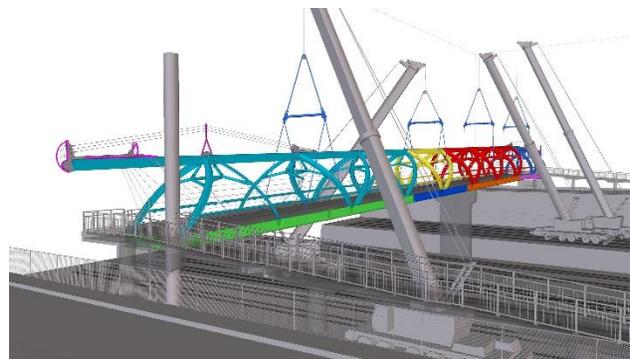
The John Street Pedestrian Bridge in Toronto, Canada was shipped to site in a minimal number of pieces. There was adequate space adjacent to the railway cut for site assembly to take place. As it was to be erected over a rail corridor, the erection had to take place at night to accommodate a 4 hour stoppage of train traffic. The position of the crane was chosen to allow a clean swing lift from the staging area north of the tracks to the finished position. Drawing by Walters Inc. Steel Fabricators.
